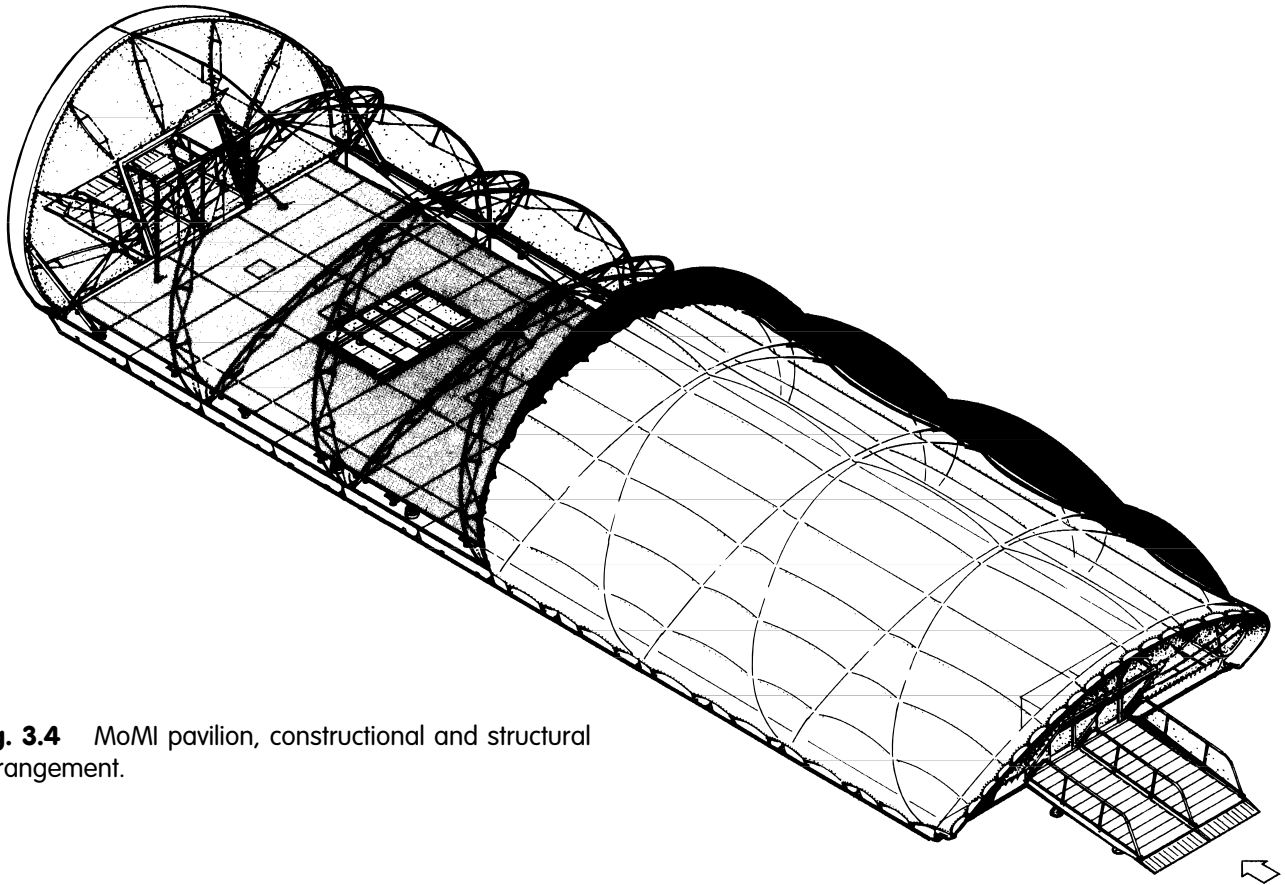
MoMI pavilion, constructional and structural arrangement.
